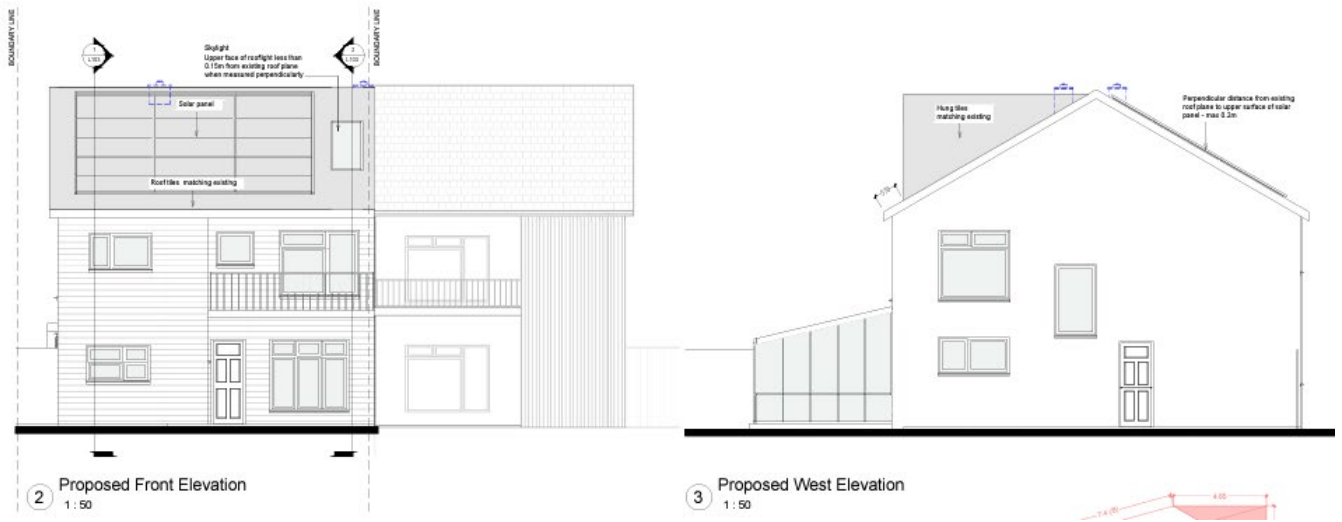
Proposed Front and West Elevations to 94 Temple Sheen Road
